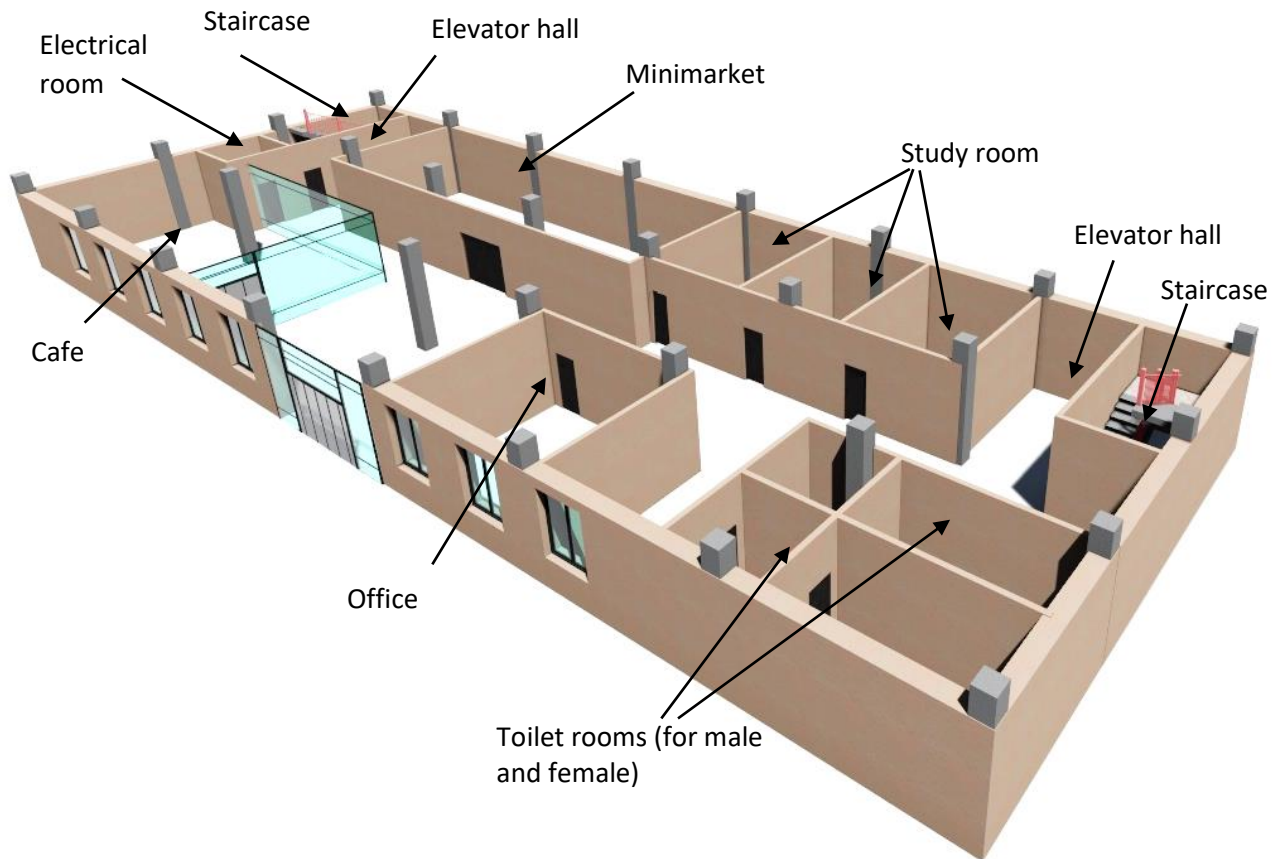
Rendered ground floor plan (AutoCAD – Lumion 6)
